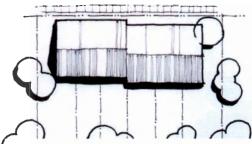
All townhouse units shall have private yard areas of at least 400 square feet.
